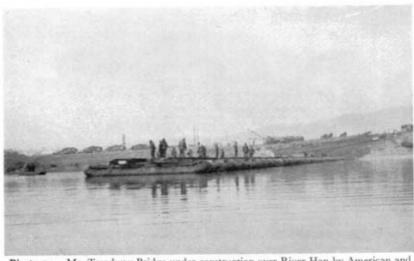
M2 Treadway Bridge under construction over River Han by American and British Engineers.
